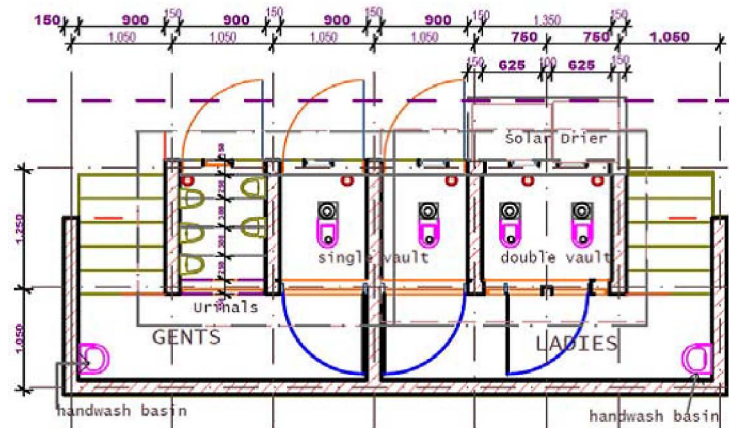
Floor plan of UDDTs of house of fire ministries (ROSA Nakuru; 2009)
